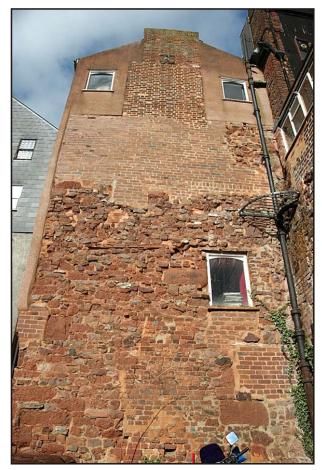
View of the gable end of the extension showing the brick chimney inserted at ground-floor level (bottom centre), the refacing of the second-floor elevation (centre, top) and the later 18th-century fabric enveloping the chimney stack above.
